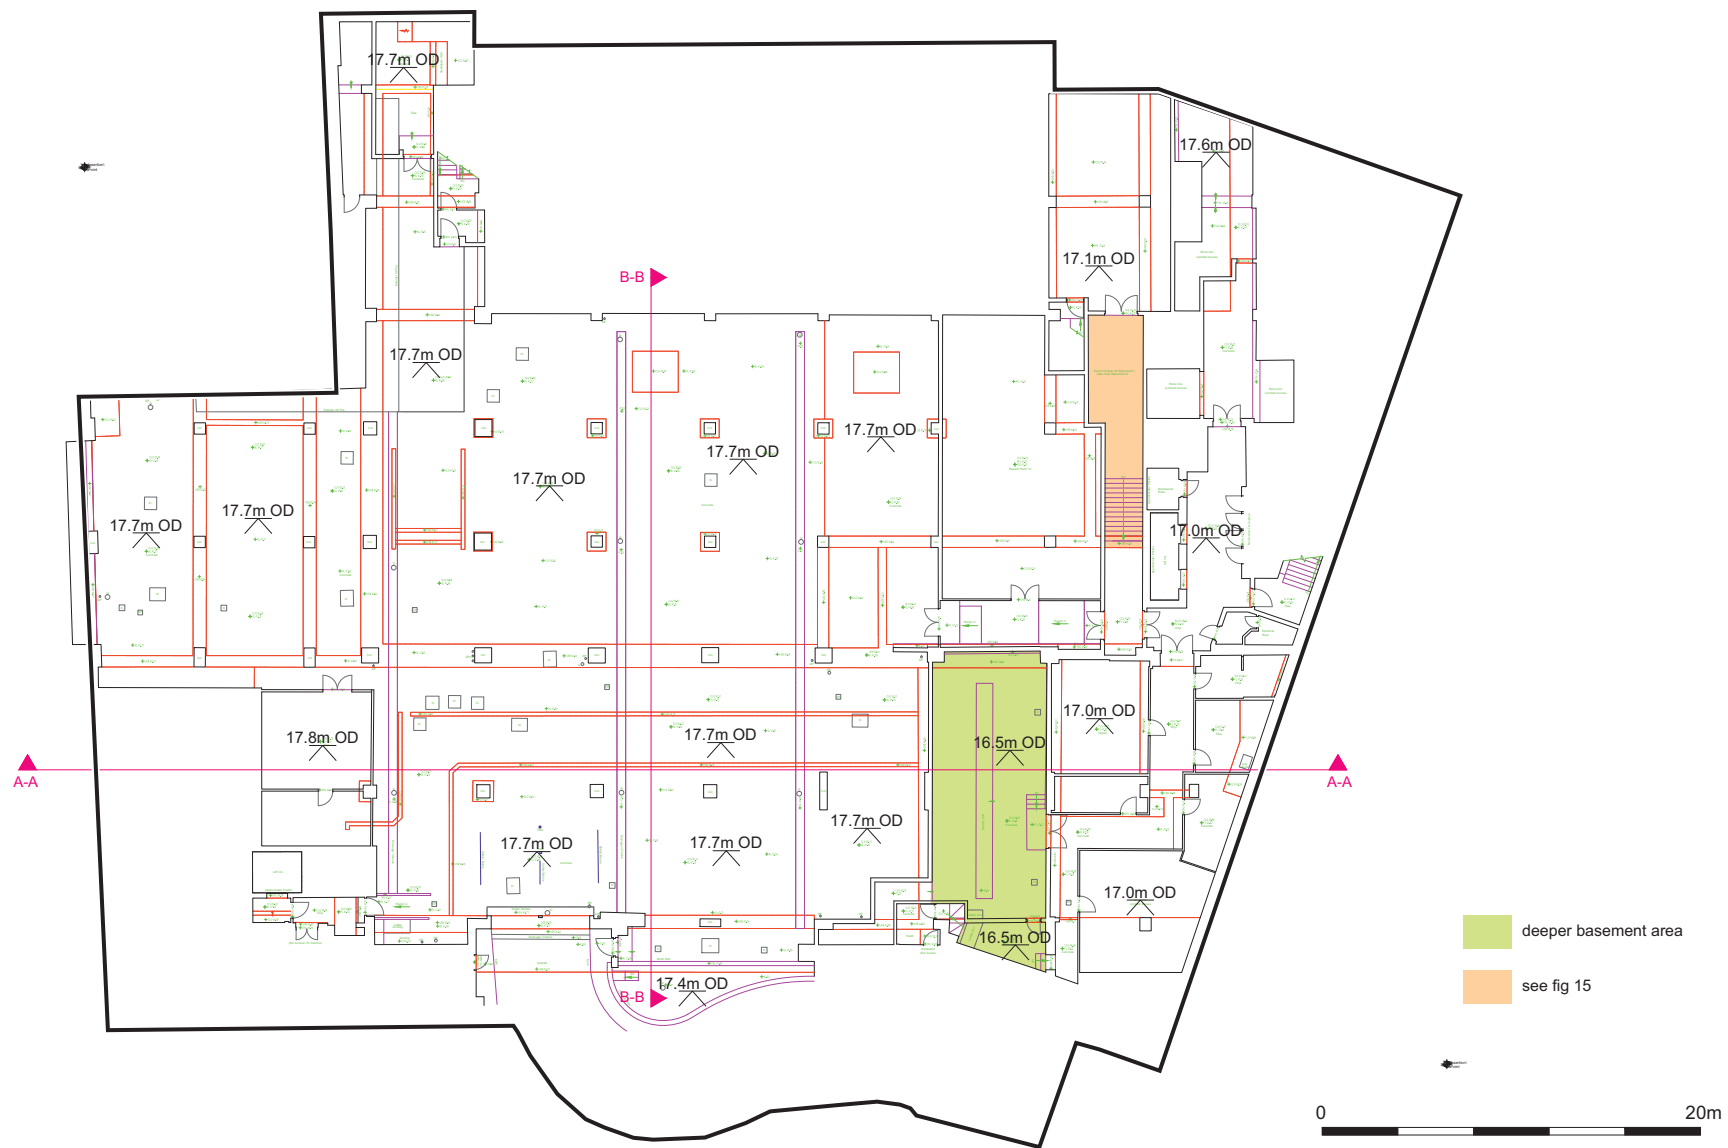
Plan of existing basement (Omega Geomatics, dwg no. 2/10, April 2011)
